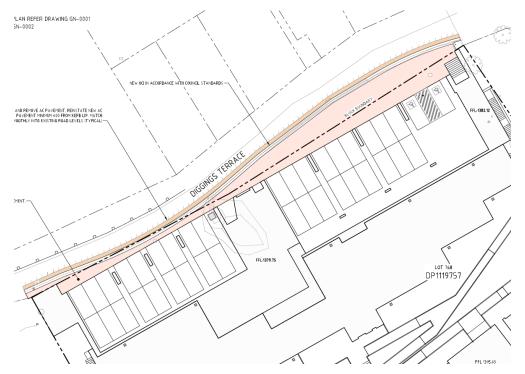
Proposed 20 Parking Spaces with 18 Additional Tandem Spaces
